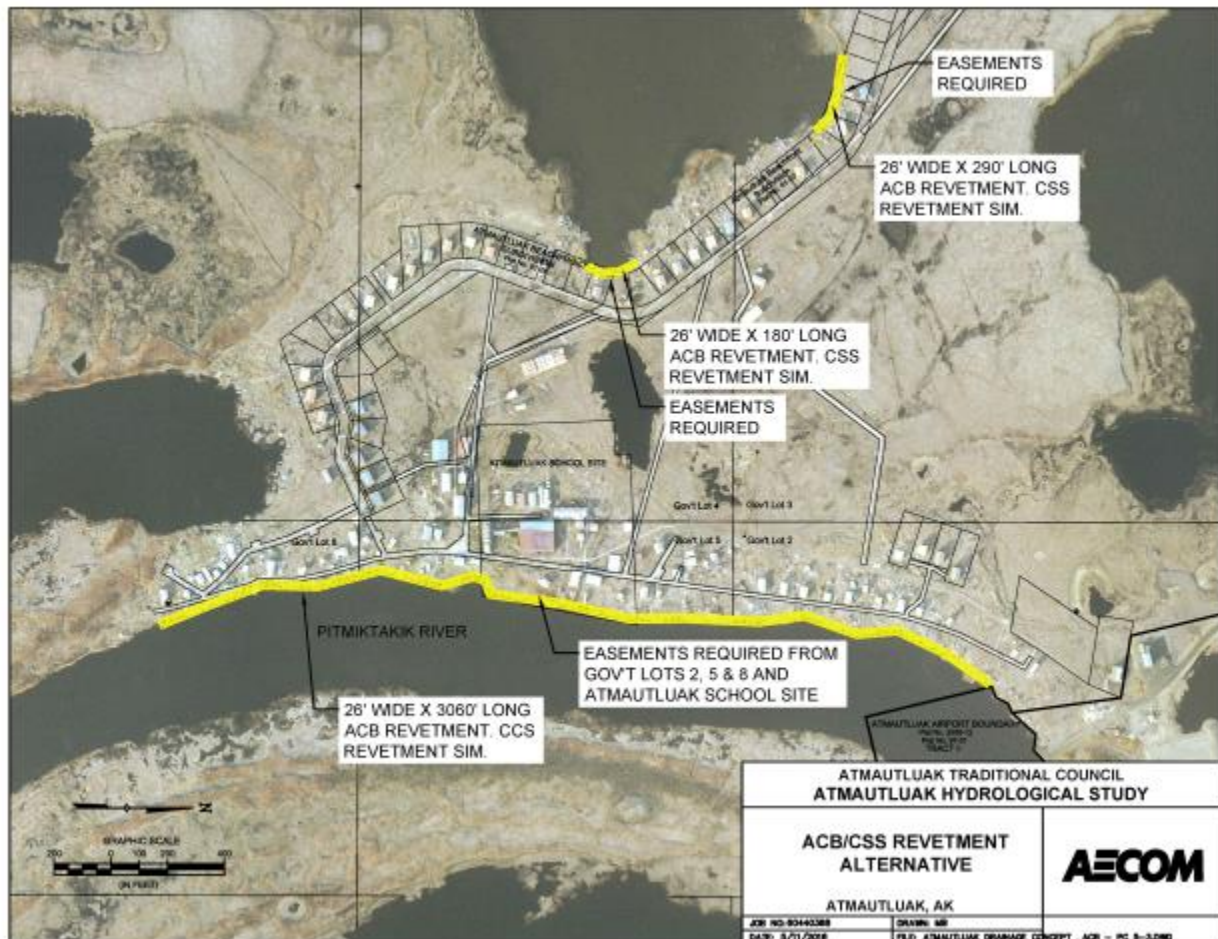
Articulating Concrete Block /Geo-Cell Plan
